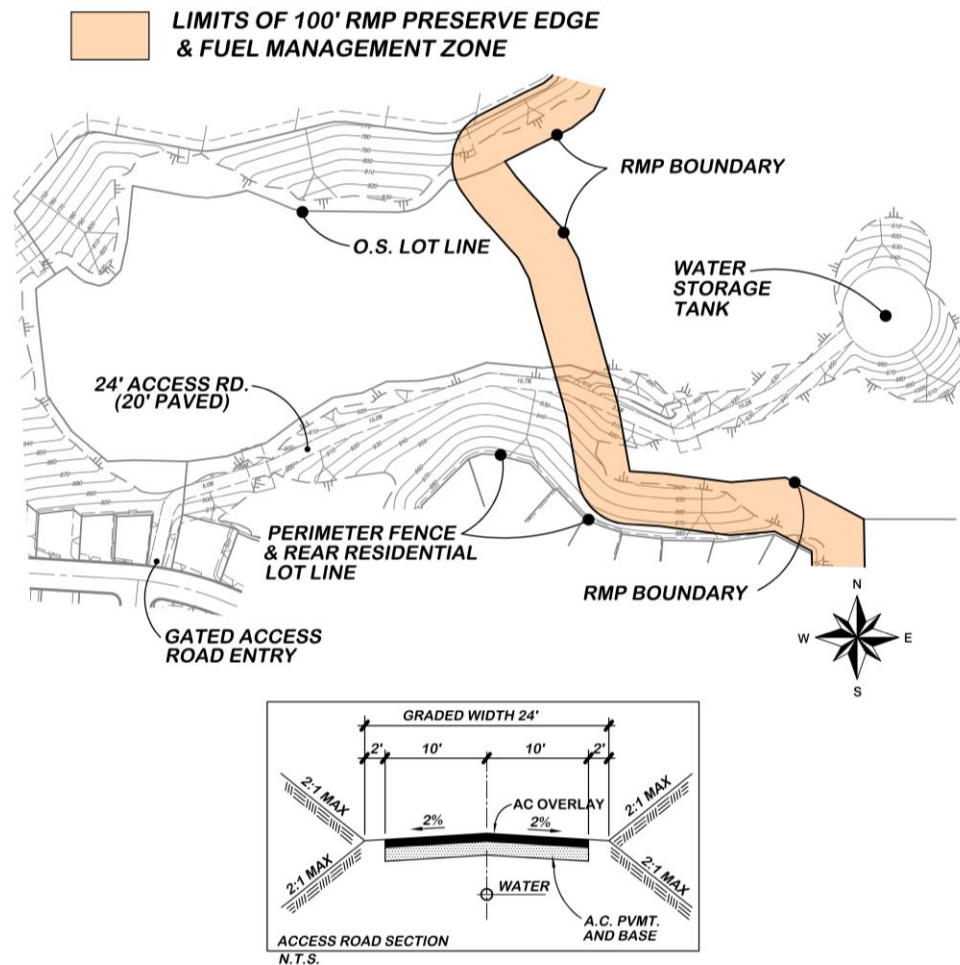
OWD 980 Storage Tank/ Waterline Maintenance / Access Road
